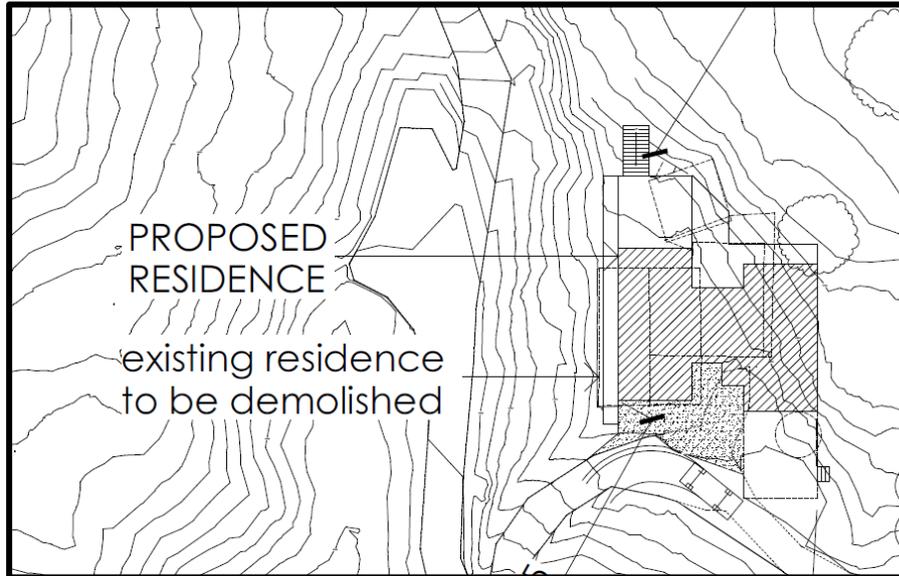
Snip of Site Plan showing proposed and existing building footprints.
